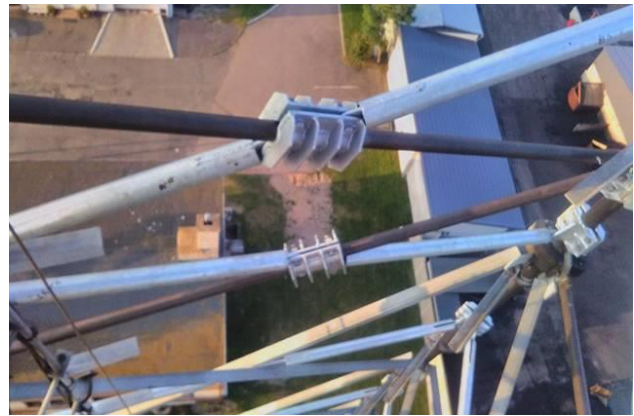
Leg reinforcement in a tower with a single bracing pattern – additional diagonal braces mirroring the original bracing pattern
